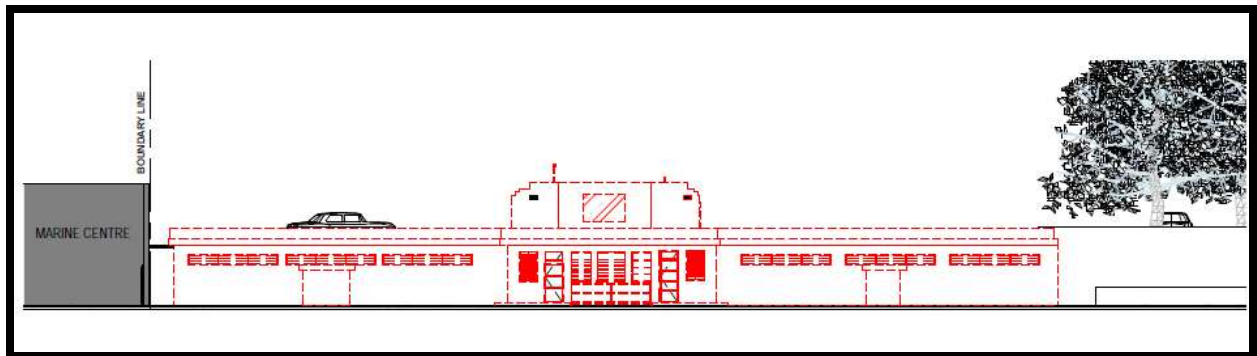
Southern Elevation of the Bathers Pavilion showing all the elements (outlined in red) of the building to be demolished (plan courtesy of Conybeare Morrison International, 2020)
